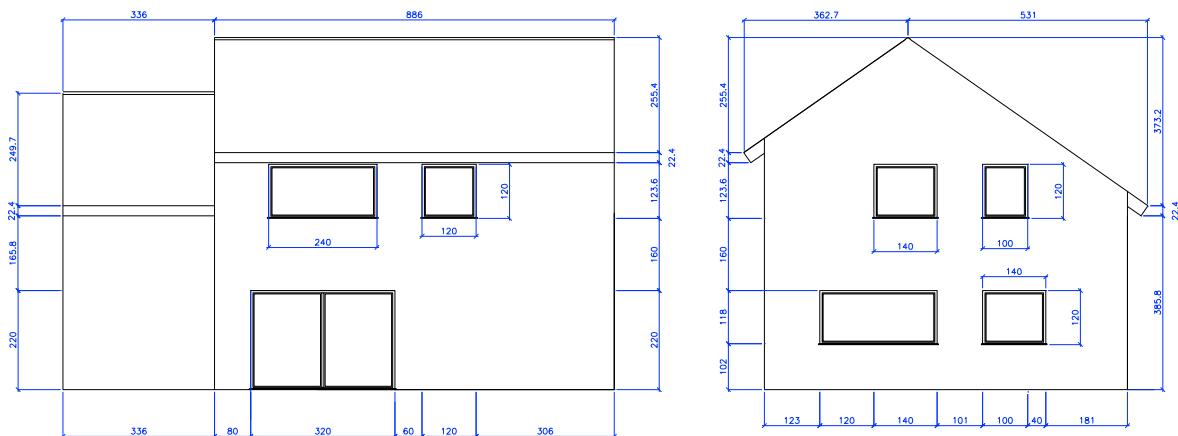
Detached house: South elevation (left) and East elevation (right)
